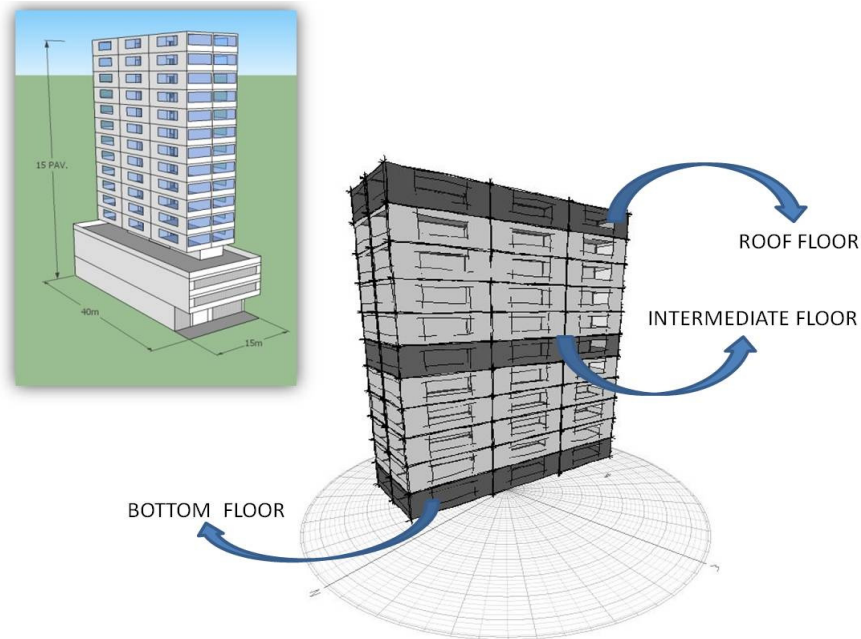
Office tower subdivisions: roof floor, intermediate floor and bottom floor
